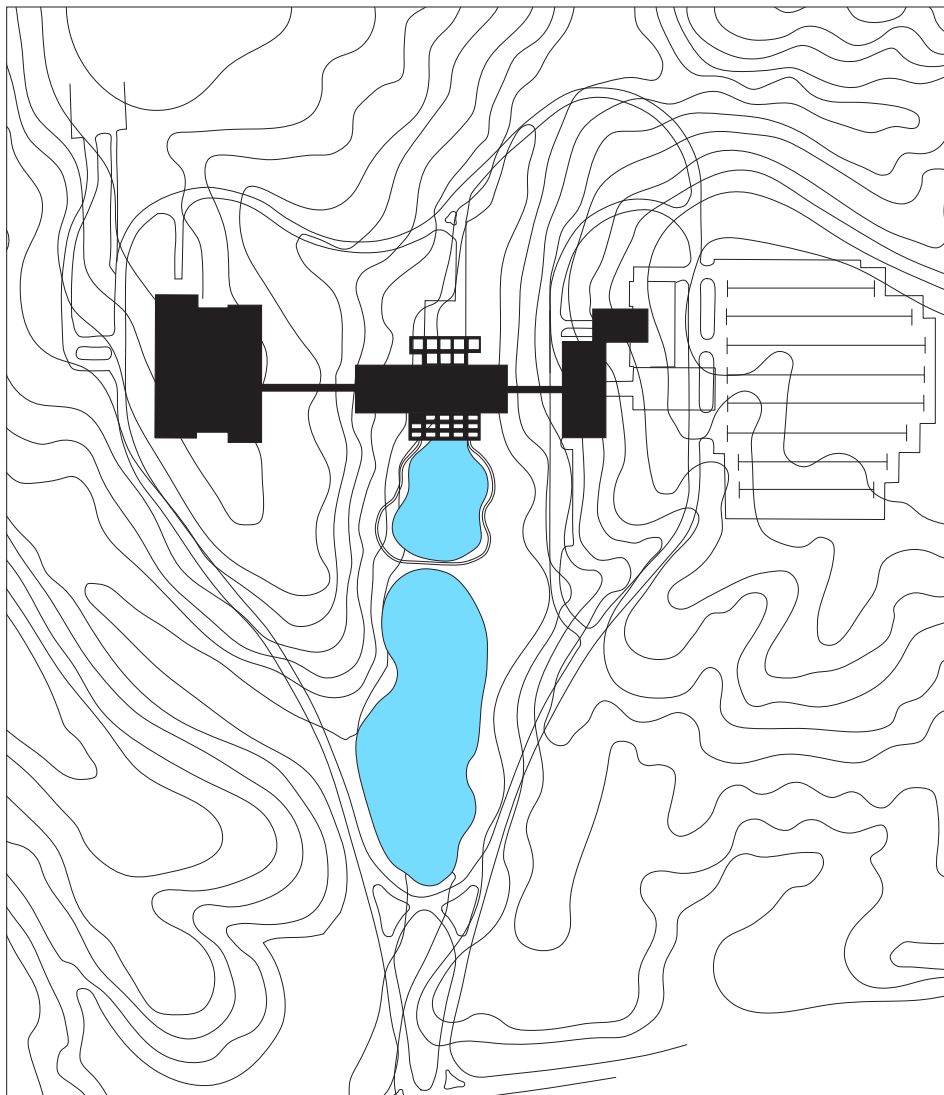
Site plan. Source: Original, redrawn from Mozingo 2011.
